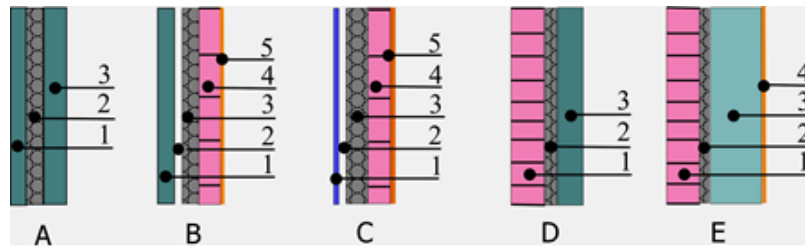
IMS façade, composition [11]: A - Prefabricated panel and parapet: 1. Concrete 6 cm; 2. EPS (expanded polystyrene) 6 cm; 3. Concrete 8 cm; B - Semi-prefabricated ventilated façade: 1. Prefab concrete casing 6 cm; 2. Air layer 2 cm; 3. EPS 6 cm; 4. Brick 6.5 cm; 5. Compo mortar 1.5 cm; C - Lightweight ventilated façade: 1. Asbestos cement sheeting 1 cm; 2. Air layer 2 cm; 3. EPS 6 cm; 4. Brick 6.5 cm; 5. Compo mortar 1.5 cm; D - Semi-prefabricated façade with face brick casing: 1. Perforated face bricks 12 cm; 2. EPS 4 cm; 3. Reinforced concrete 8 cm; E - Traditionally built façade: 1. Perforated bricks 12 cm; 2. EPS 2 cm; 3. Perforated concrete block 20 cm; 4. Compo mortar 1.5 cm.
